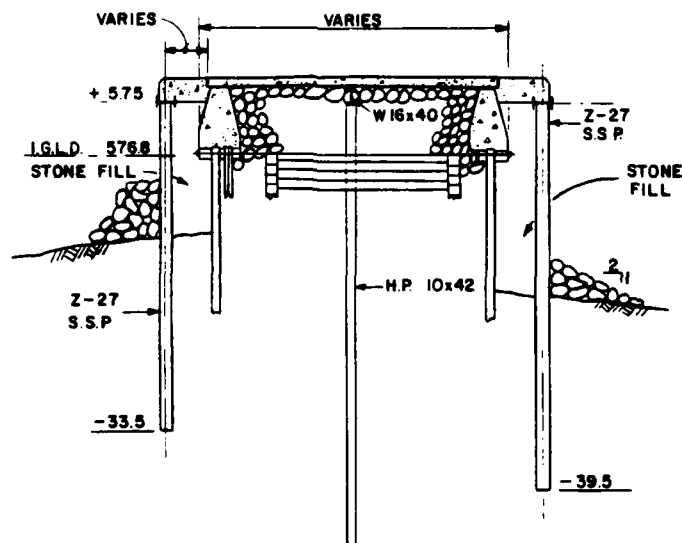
Typical breakwater and pier cross sections, Holland Harbor, Michigan
